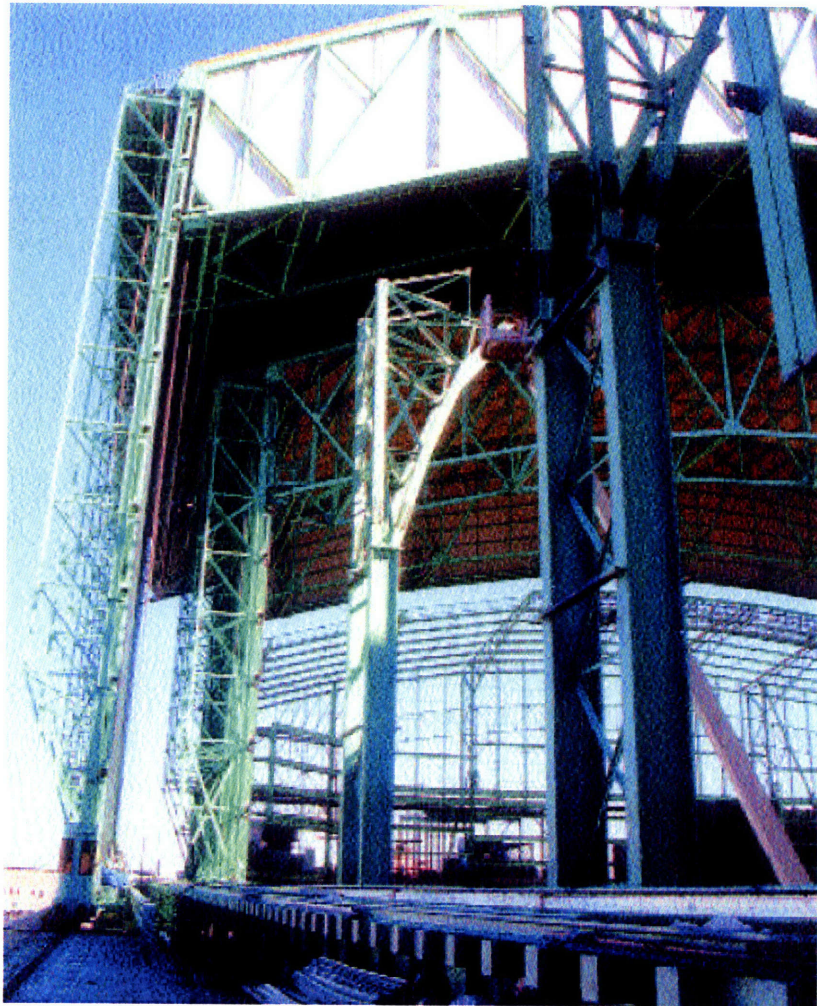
Movable roof and wall of Minute Maid Park [12]
